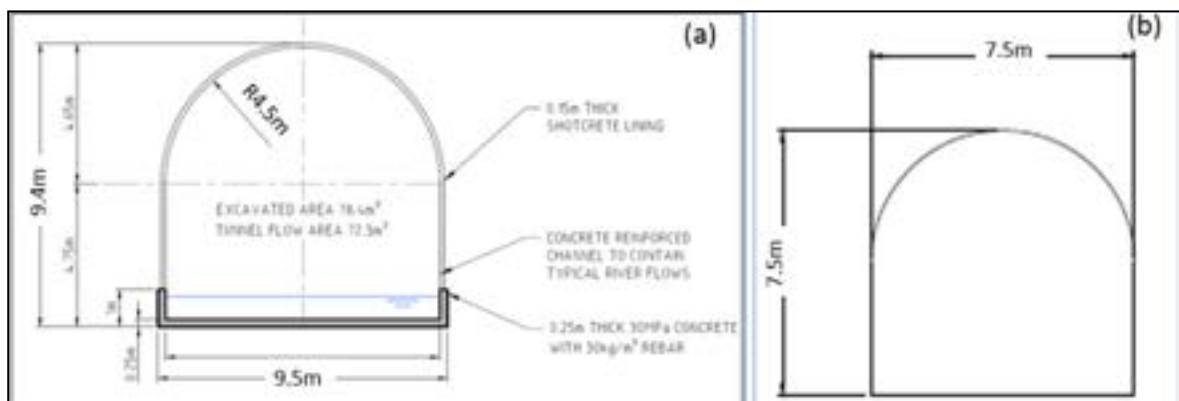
Tunnel cross-sections: a) diversion tunnel; b) conveyance tunnel
